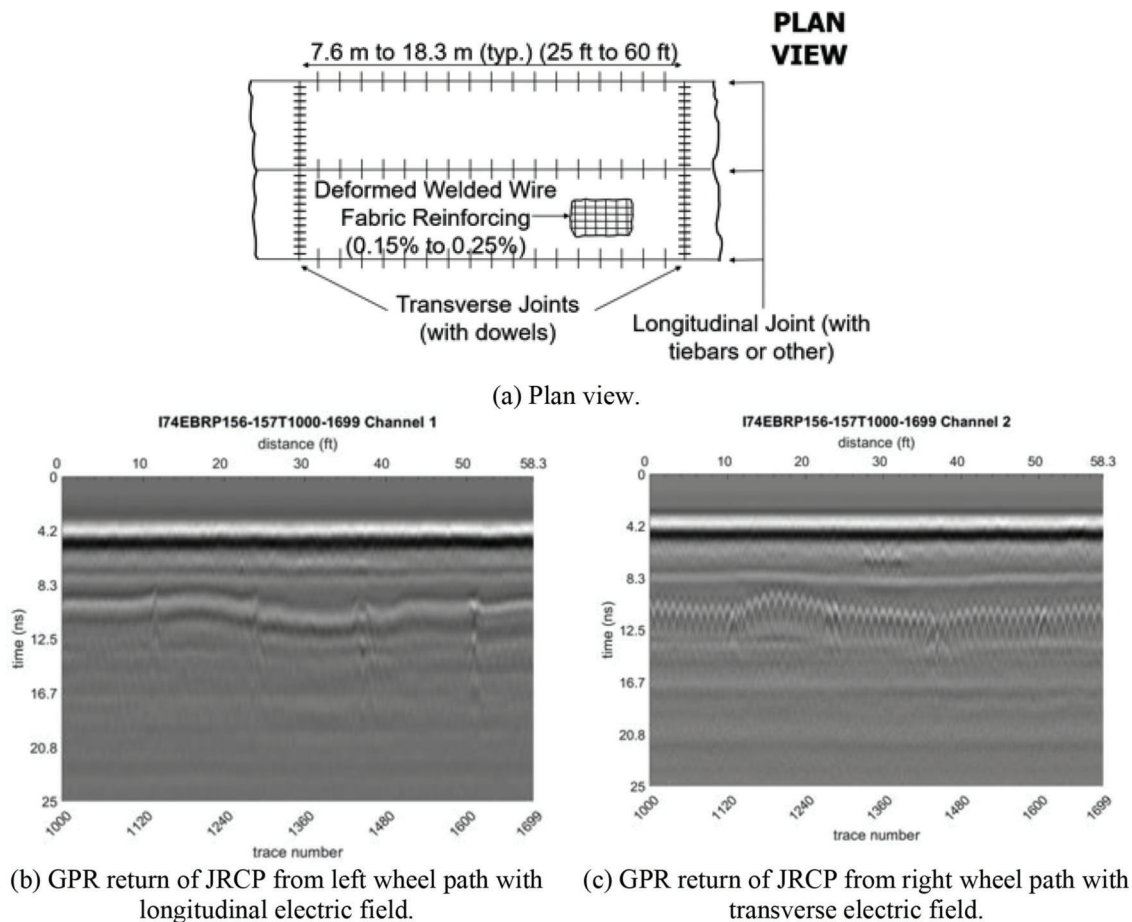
Jointed reinforced concrete pavement (JRCP).
